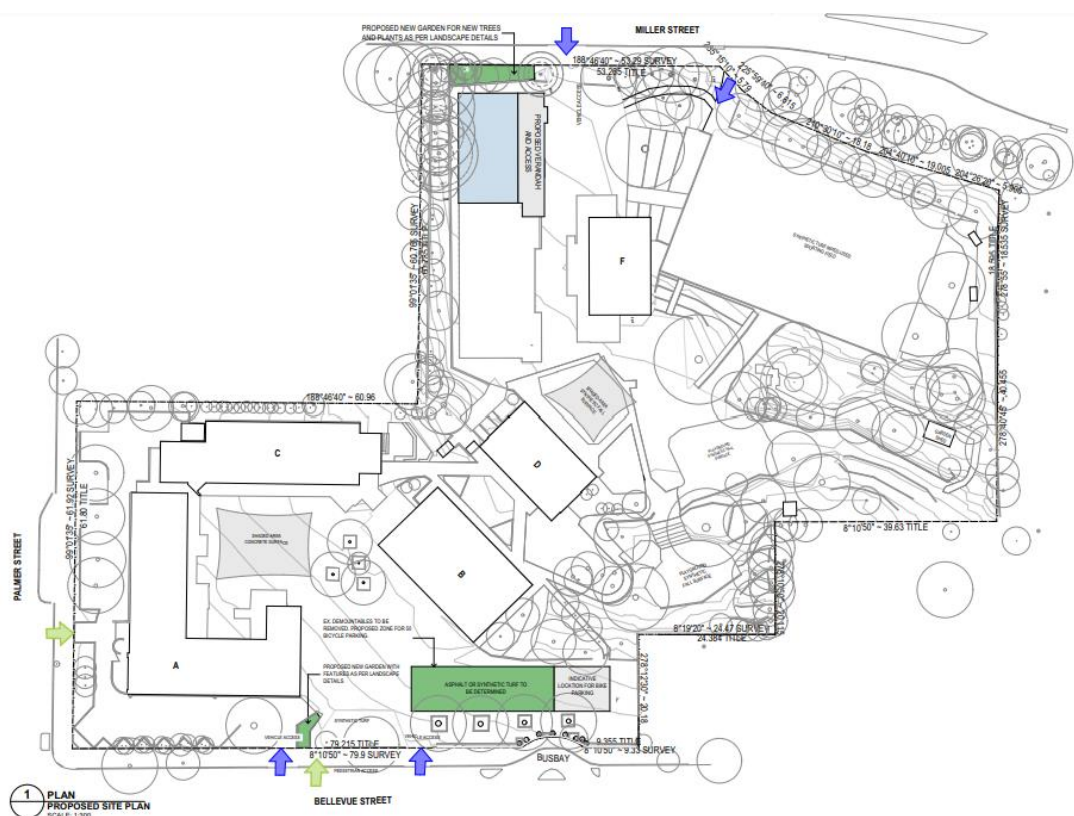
PROPOSED SCOPE OF WORKS (SOURCE: FULTON TROTTER ARCHITECTS, PROPOSED SITE PLAN (REV P6))
